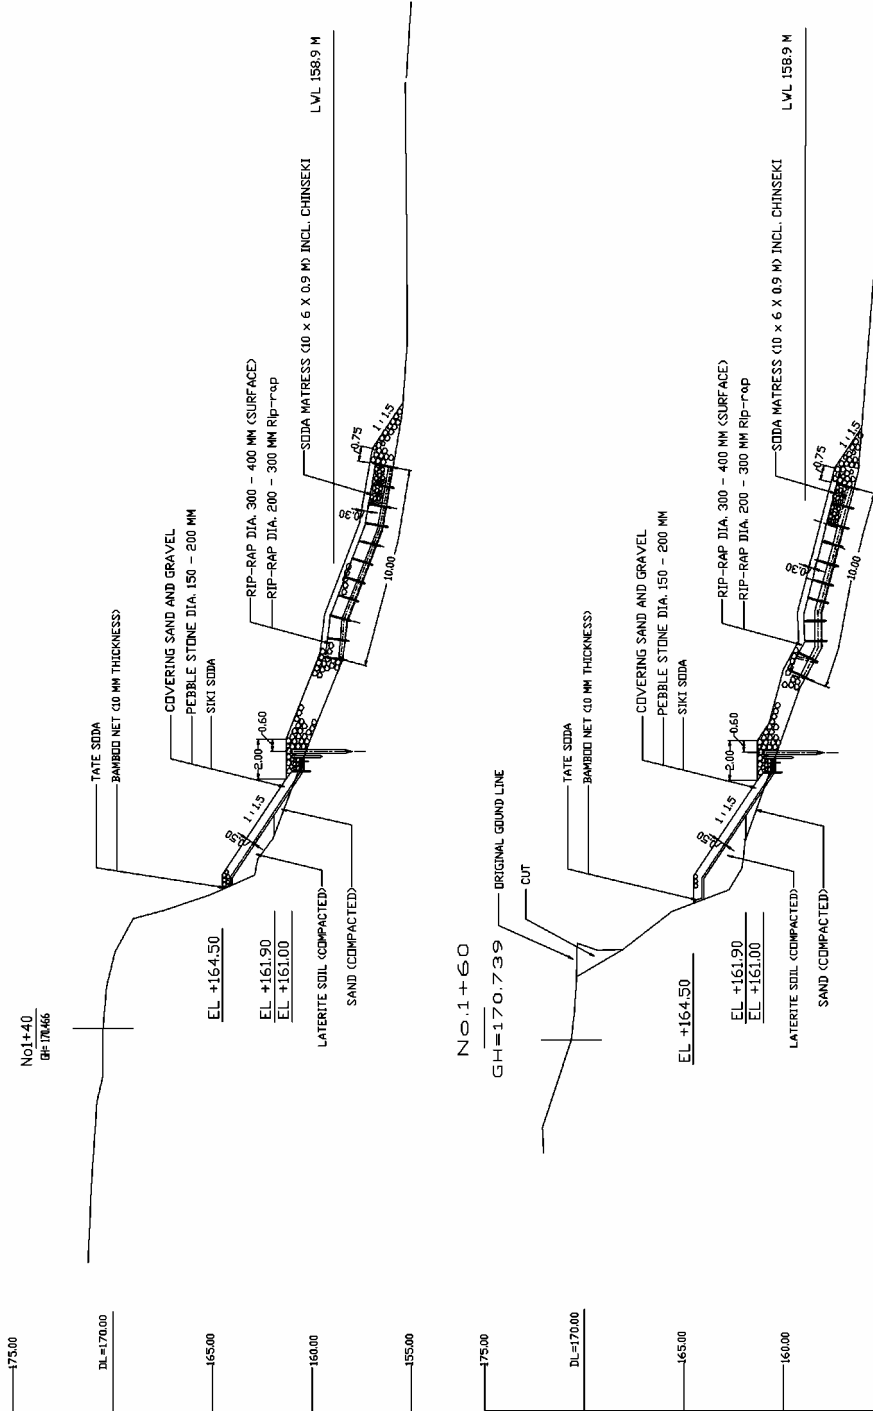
(2/2) Drawings of Sibounheuang Site
